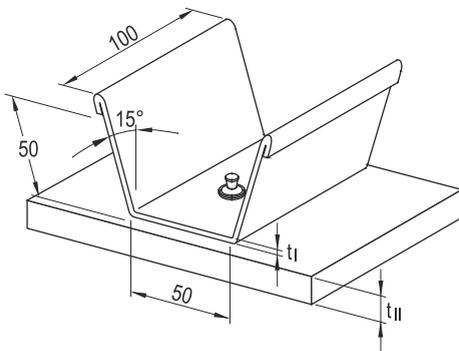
Shape of sheet specimen for tensile testing of sheeting
